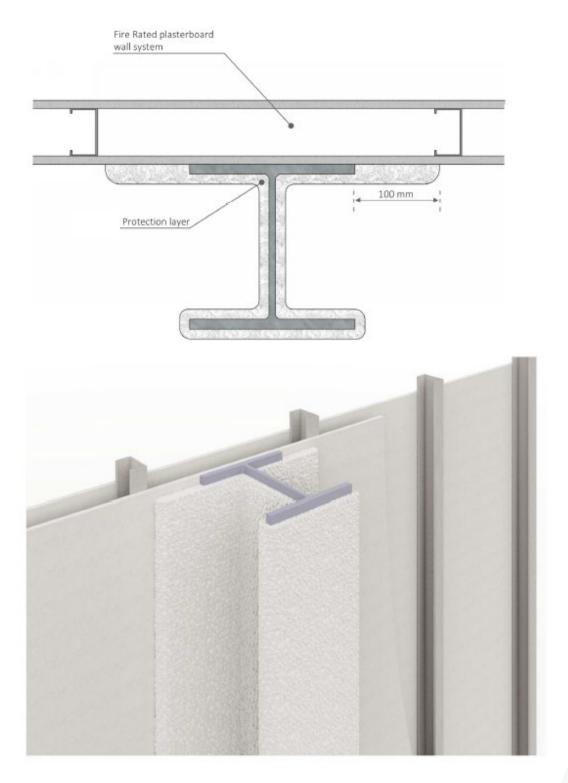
PERLIFOC HP Eco+ or PYROCRETE 60 spray protected steel column interfacing with fire rated board wall systems
